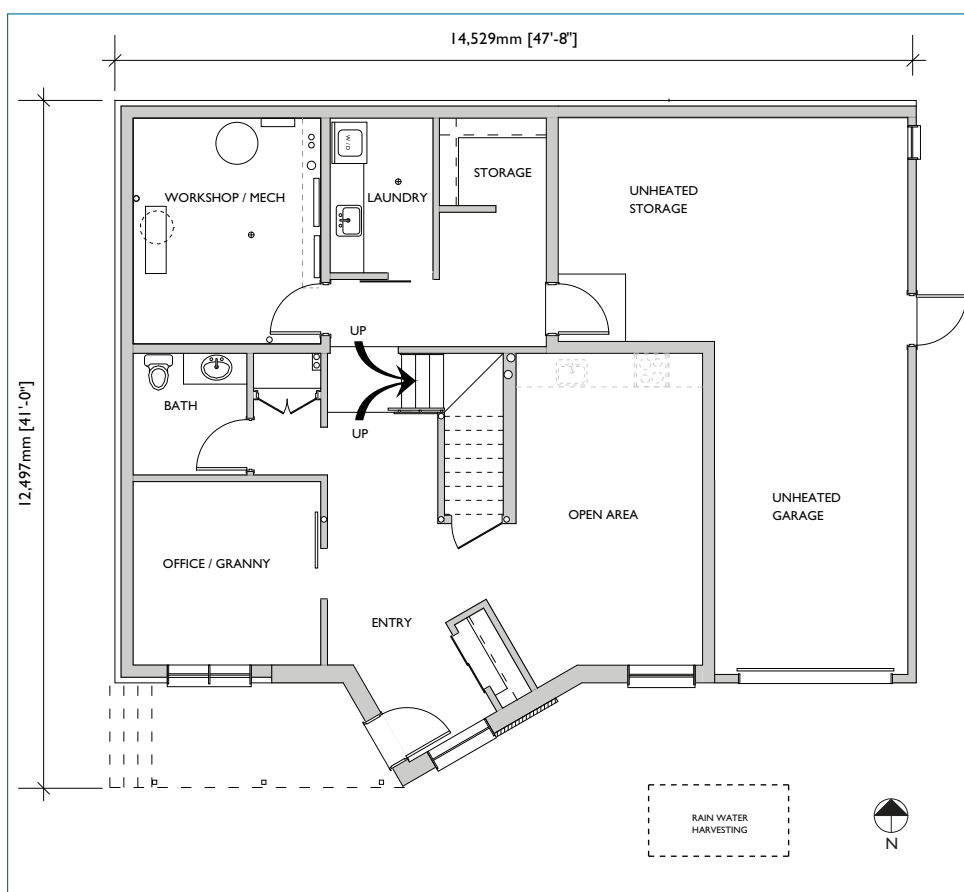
Lower floor plan of the EchoHaven EQUilibrium™ Project
